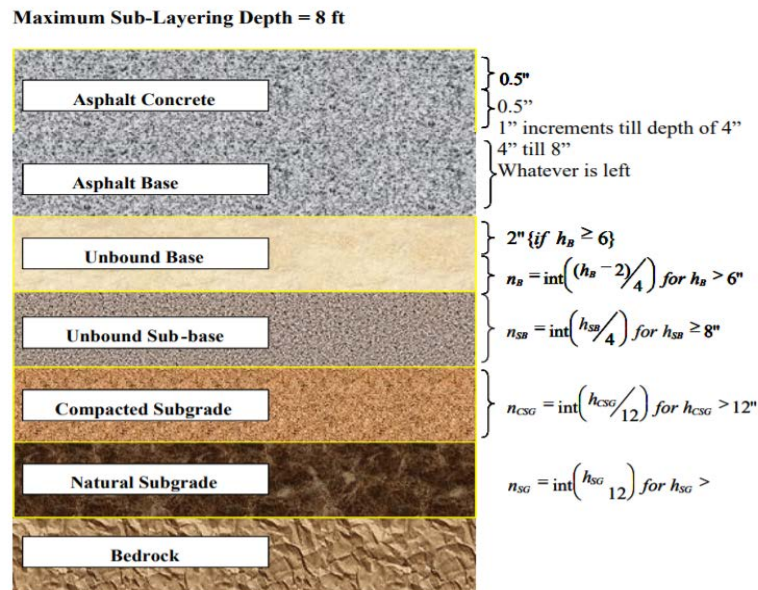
MEPDG sub-layering of pavement cross-section for flexible pavements.
